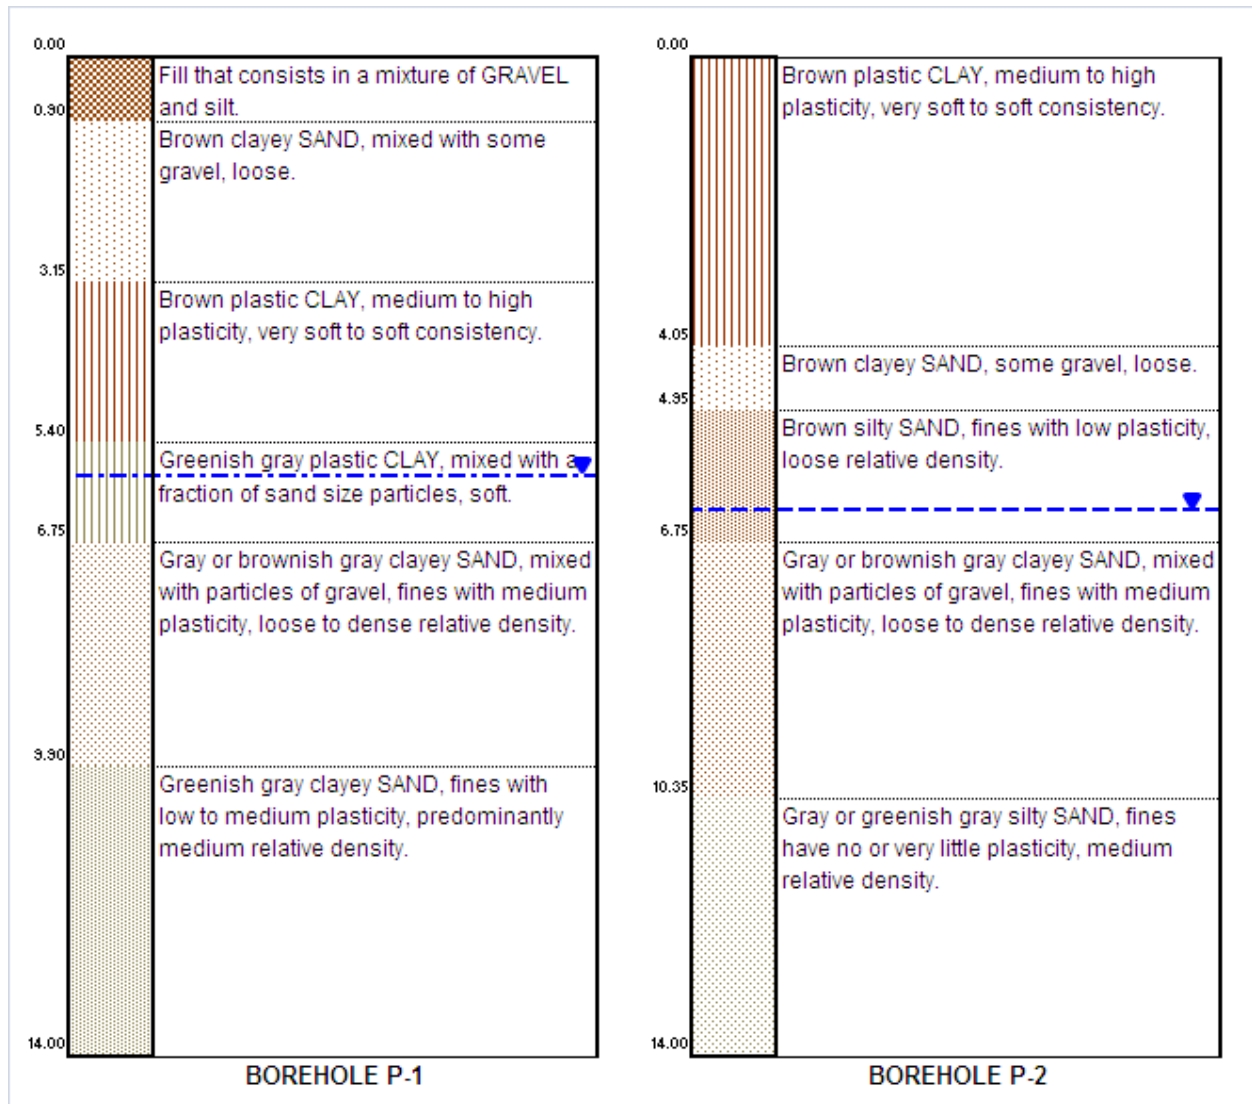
Soil profile detected at the Río Bananito Railroad Bridge site
